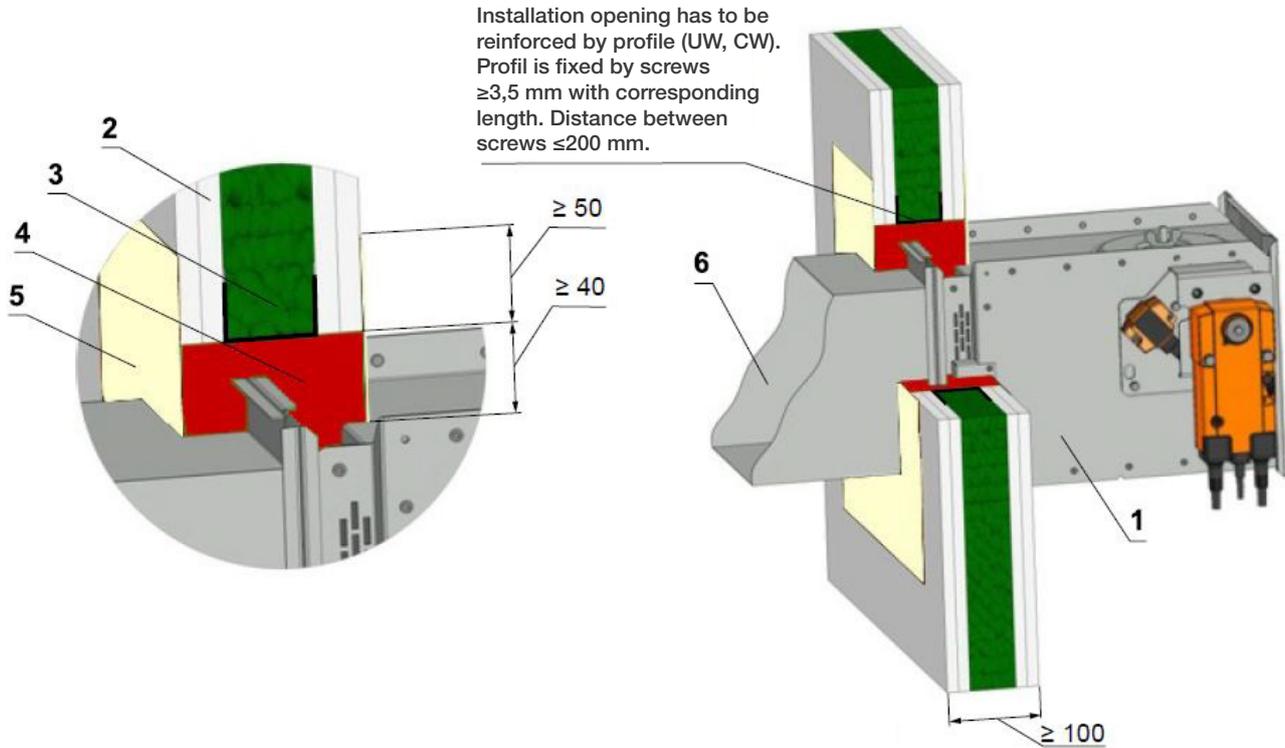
Gypsum wall construction- fire protection foam with stucco plaster
